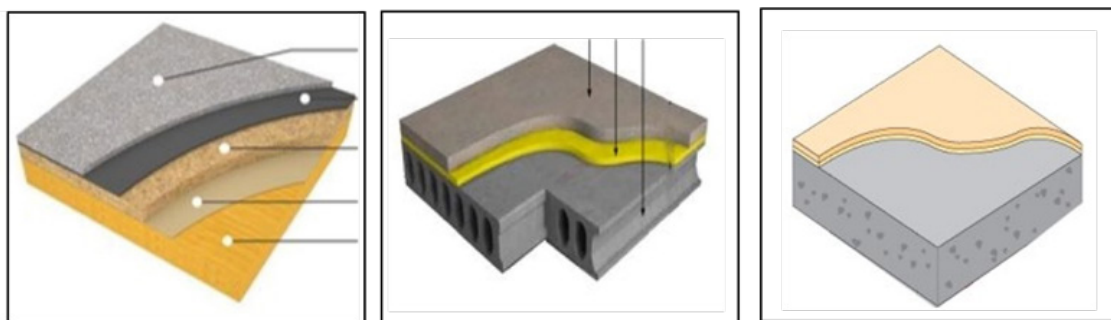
(A) The components of a CLT floor [30]; (B) The components of a hollow-core concrete floor system [31]; (C) The components of a solid concrete floor system [31]
